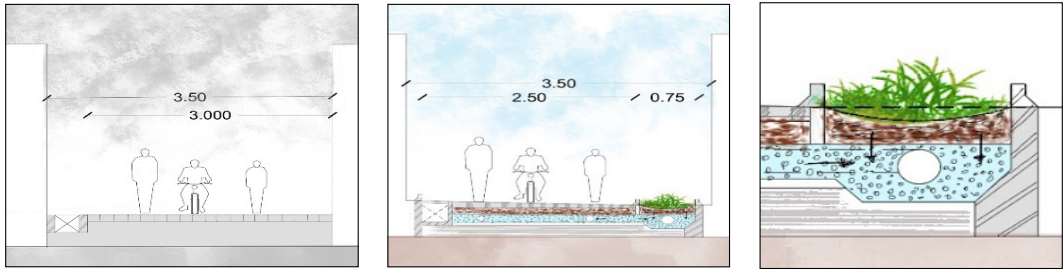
Existing Road Section of Sub-Arterial Roads (Left Image) & Proposed Road Sections for Burst Pipe Road (Right Image)
